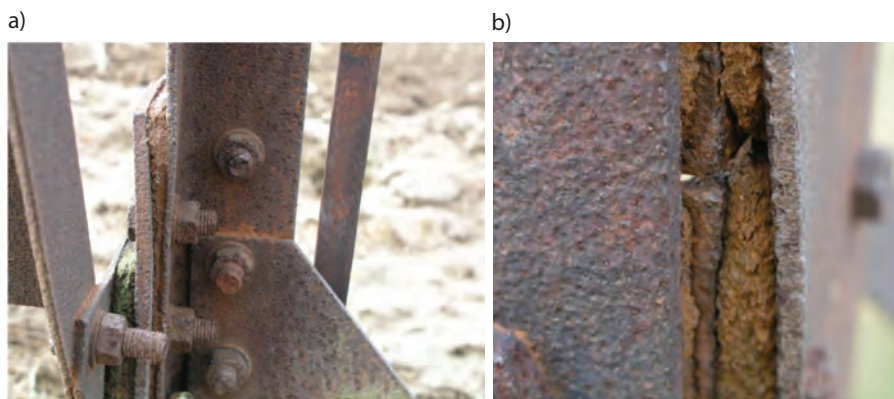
Crevice corrosion of weathering steel between a tower structure component and a gusset plate: a) general view, b) enlargement of the contact area (photo: Jacek Bordziłowski)
